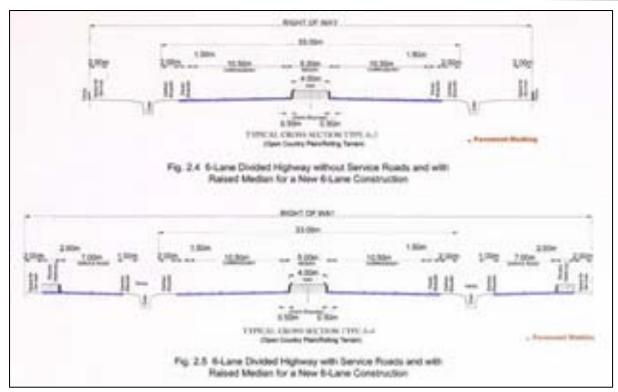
Typical Cross-section of 6 lane road with Raised Median
